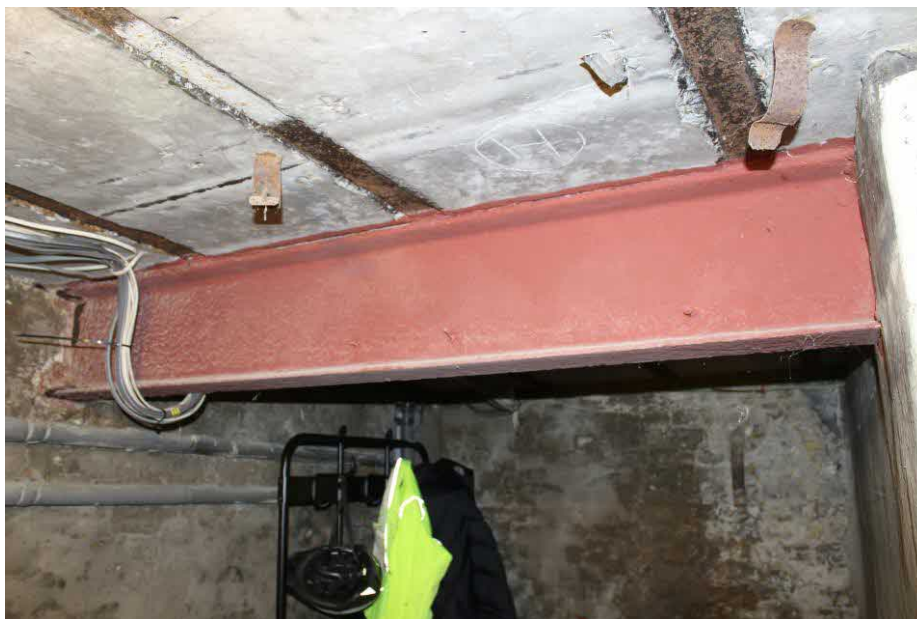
Detail of girder supporting ceiling in Room 1. Photograph taken facing south-west.
